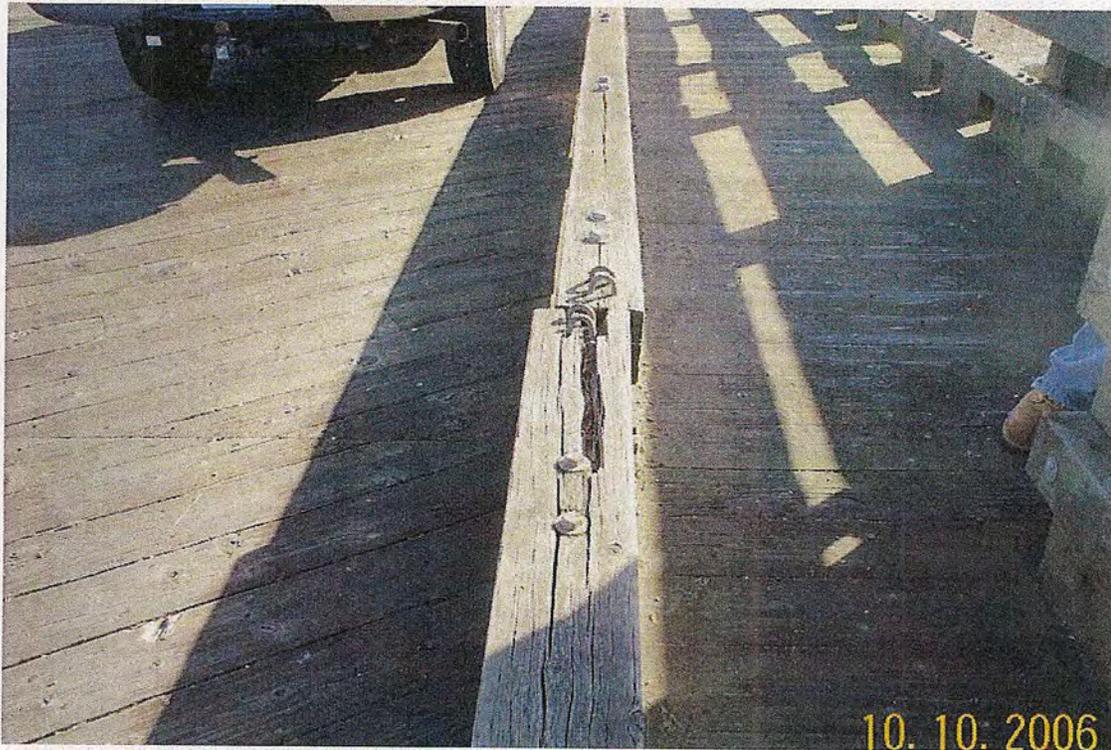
Mod/hvy deterioration of curb in bascule span at toe, looking east. Note tight deck joint & 1 1/2" shift of bascule span toe to north.
